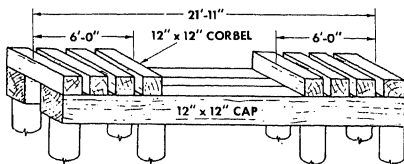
Construction of pile caps to provide seating for bearings at adjacent ends of independent spans—wood piles or trestle and cap.
